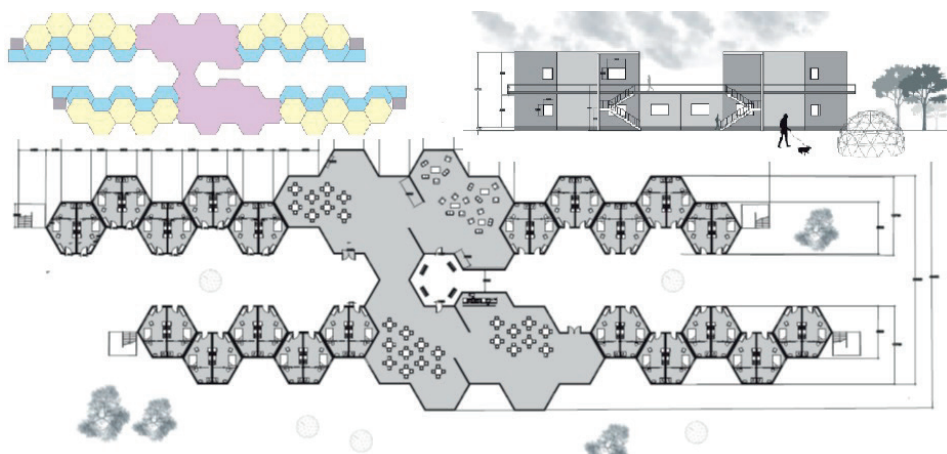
Scheme of the first floor, plan section-first floor, Elevation. Design by Gabin Peinado Paula
